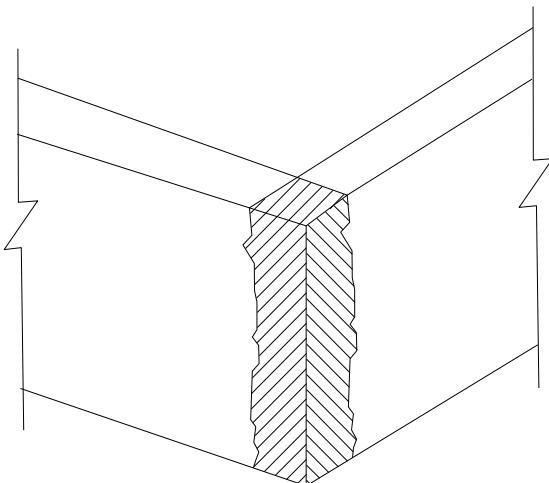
Illustrations showing (a) how vertical cracks at corner can lead to instability of intersection (source: Manual of The Getty Conservation Institute)
